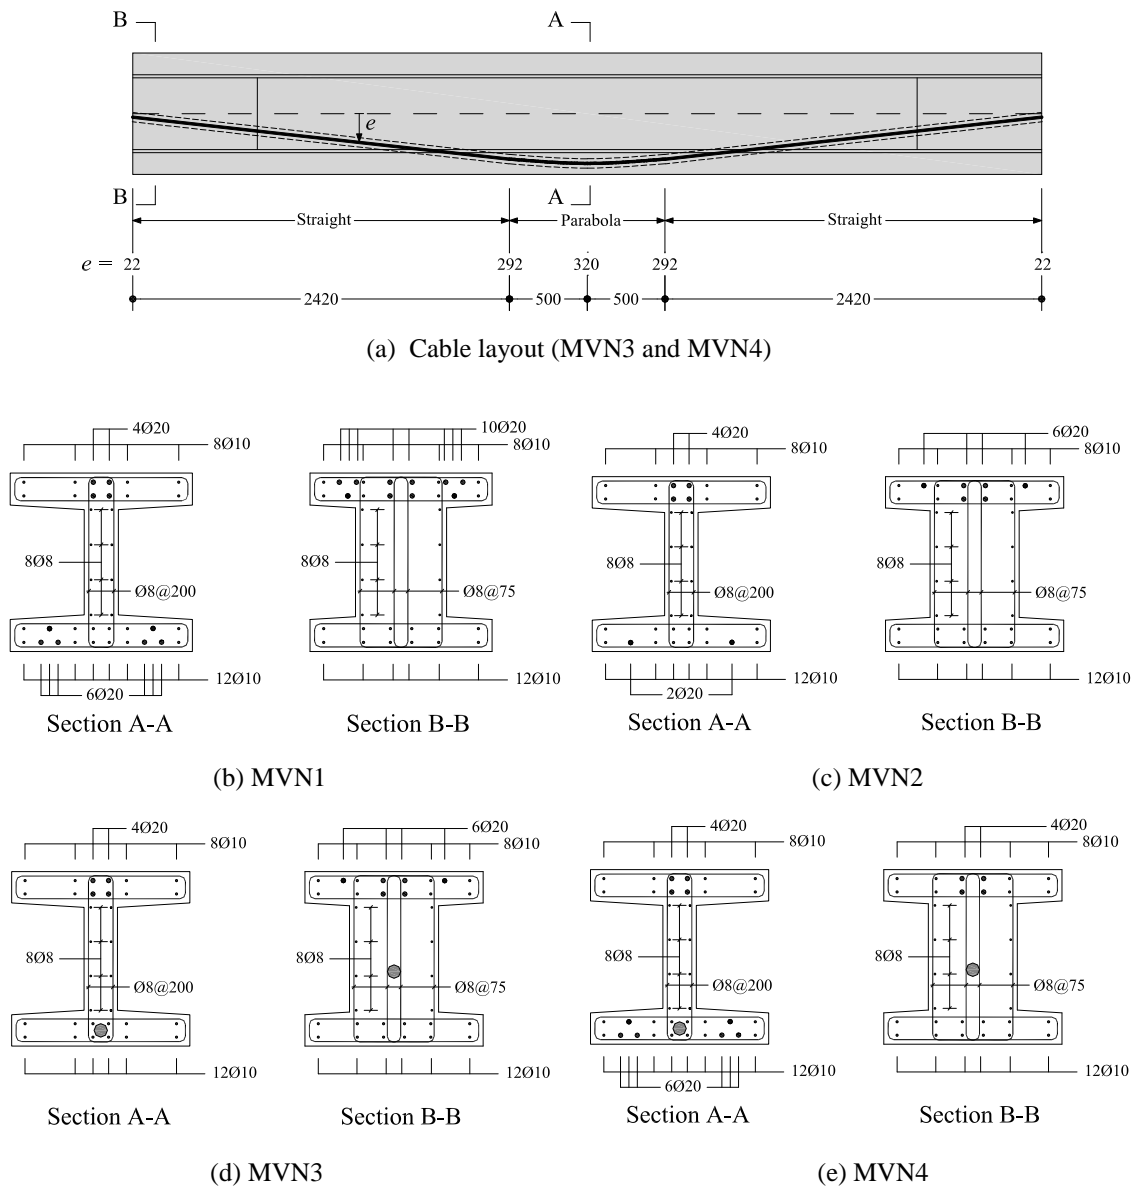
MVN series: (a) Cable layout of beams MVN3 and MVN4; (b) reinforcement content.
